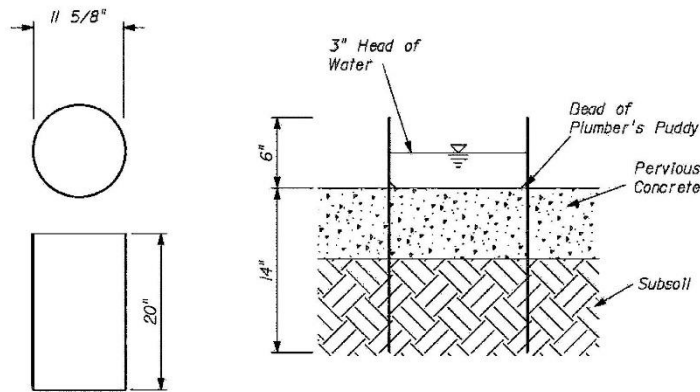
Single-ring infiltrometer (1 in. = 25.4 mm).
